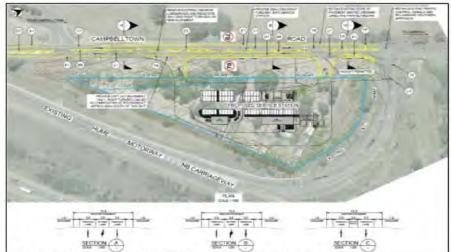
Concept Layout Site Plan. Source - J. Wyndham Prince
